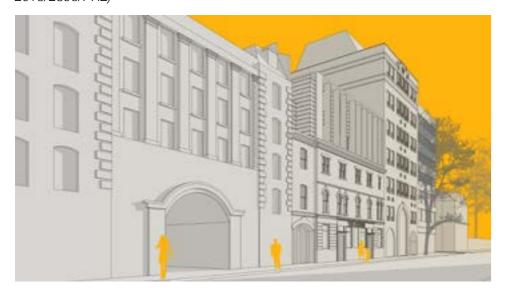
Image C: Proposed view looking up Rosebery Avenue towards Clerkenwell Road
